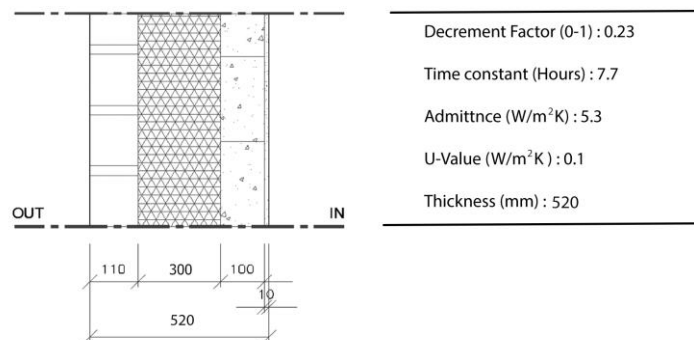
Brick and Block wall type. From Out to in: 110mm Brick Outer Leaf, 300mm Phenolic Insulation, 100mm Aerated Concrete Block, 10mm Lightweight Plaster
